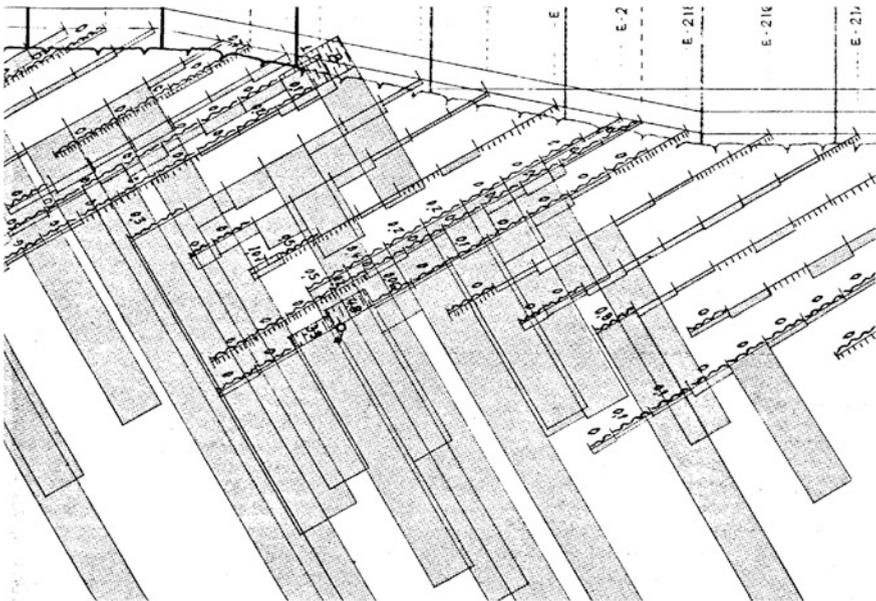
Almendra Dam. Segment of the grout curtain installed in nearly impervious rock
